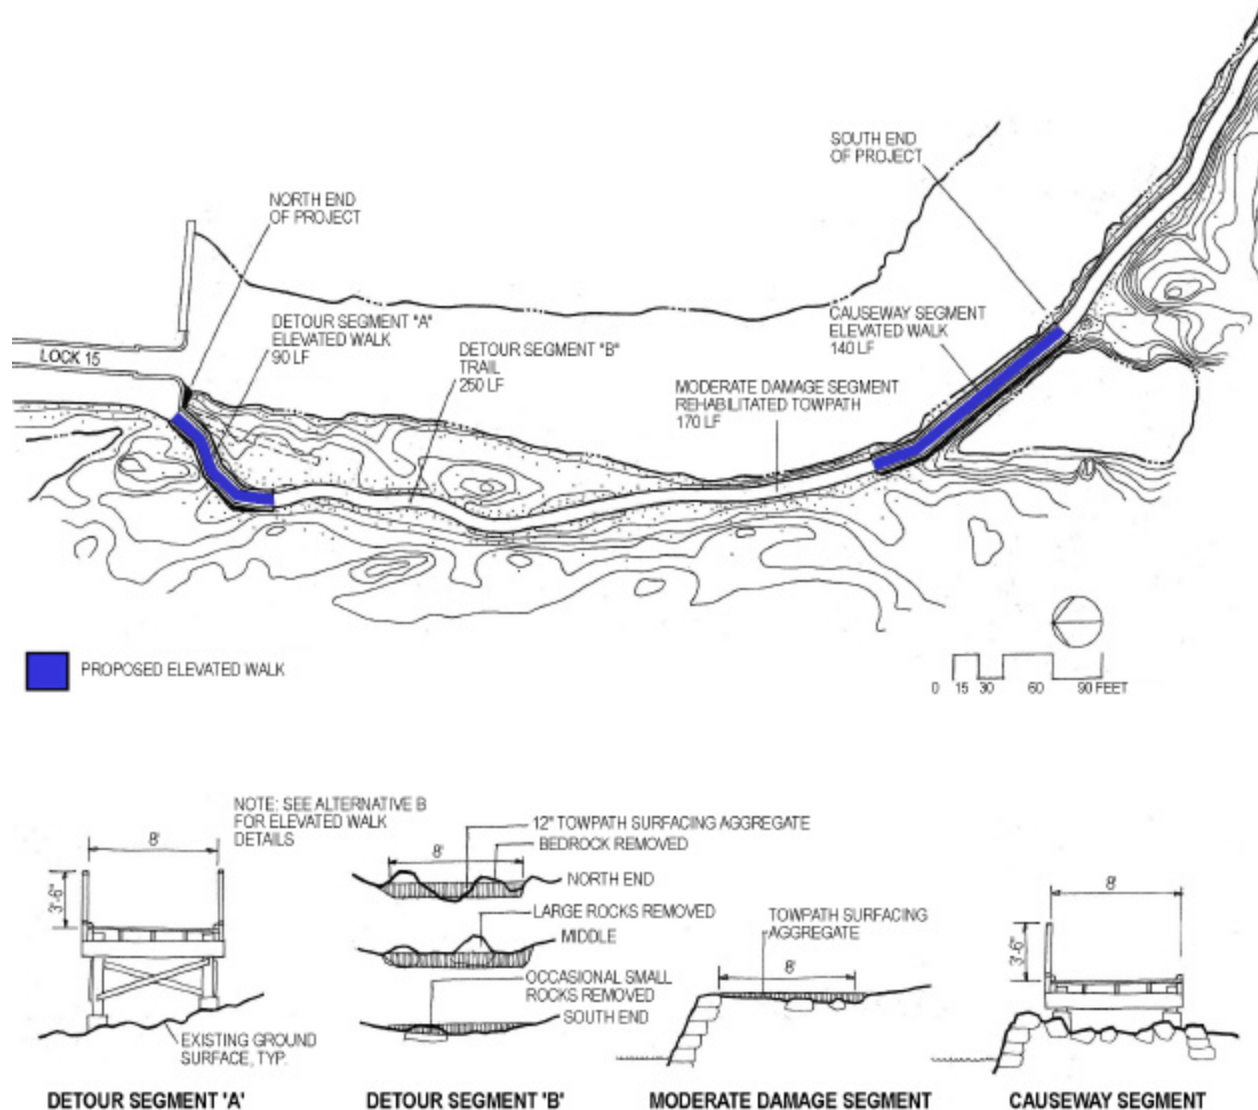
Aerial views and cross-sectional view of Alternative E - Detour and two elevated walk segments.
